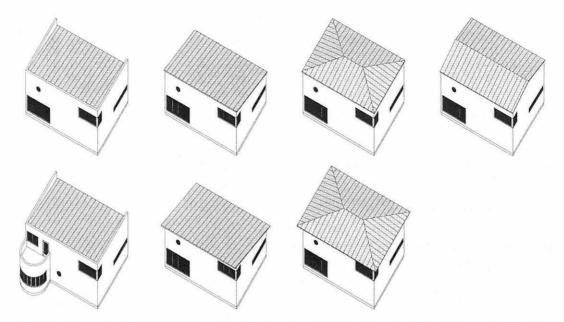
Roof shapes typical of Finnish Wood Functionalism. From left: false flat roof, shed roof, hip roof and saddle roof. Fictional building volume. Drawn by author.
